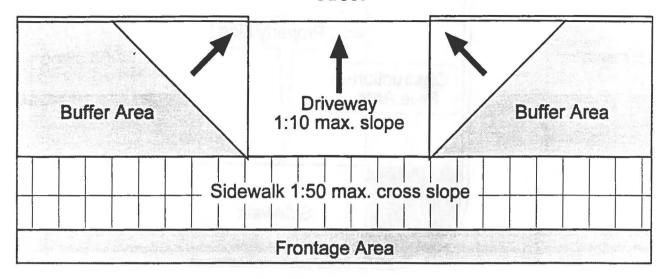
Preferred Driveway Design (adapted from the Portland Pedestrian Master Plan)
